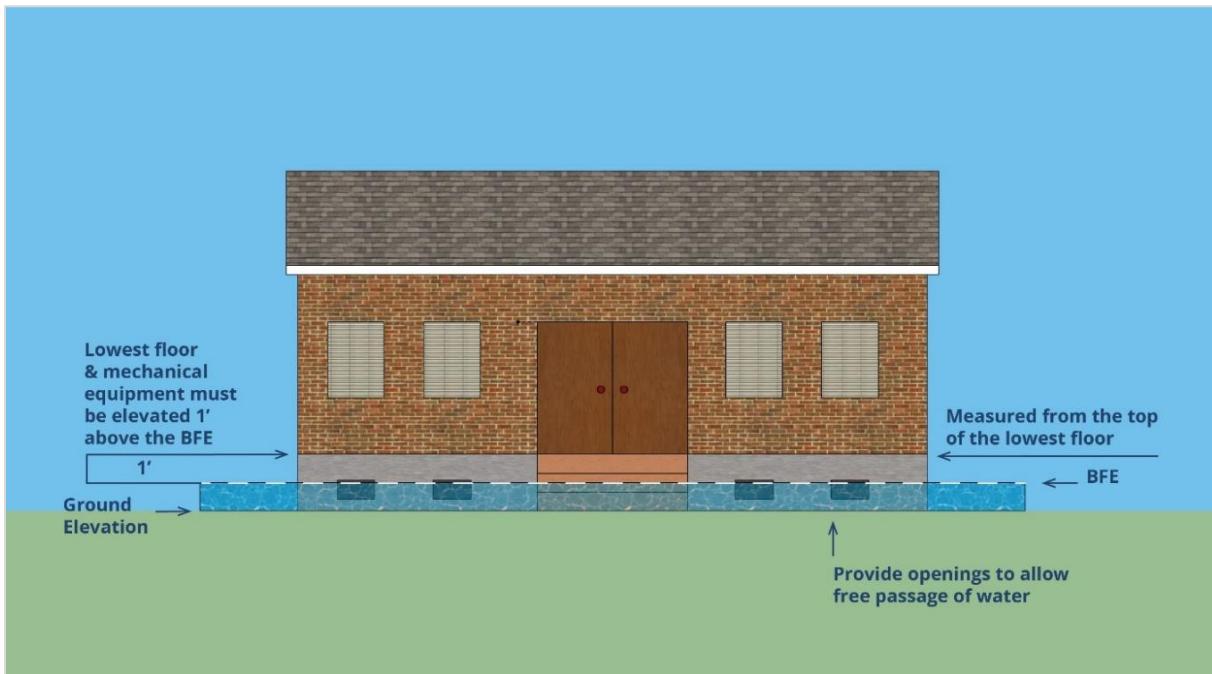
Example elevated nonresidential structure adjacent to the SFHA.
